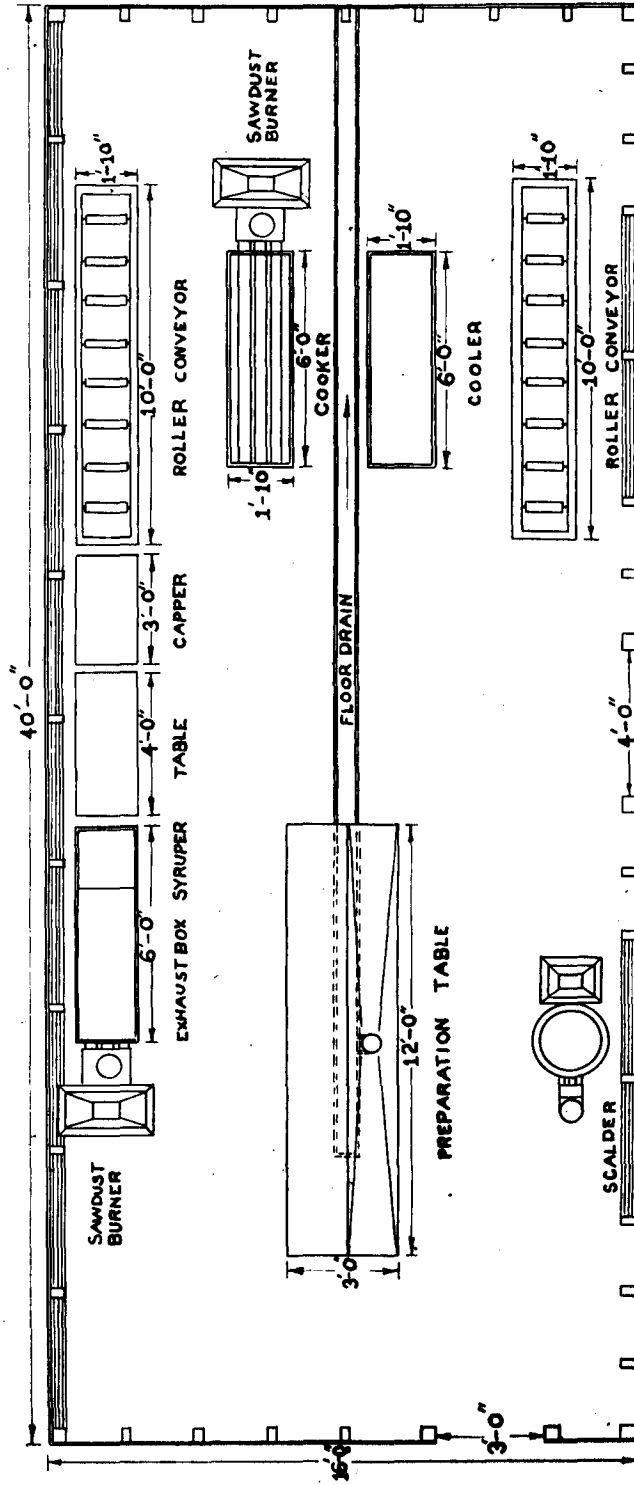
FLOOR PLAN OF No. 1 CANNERY
